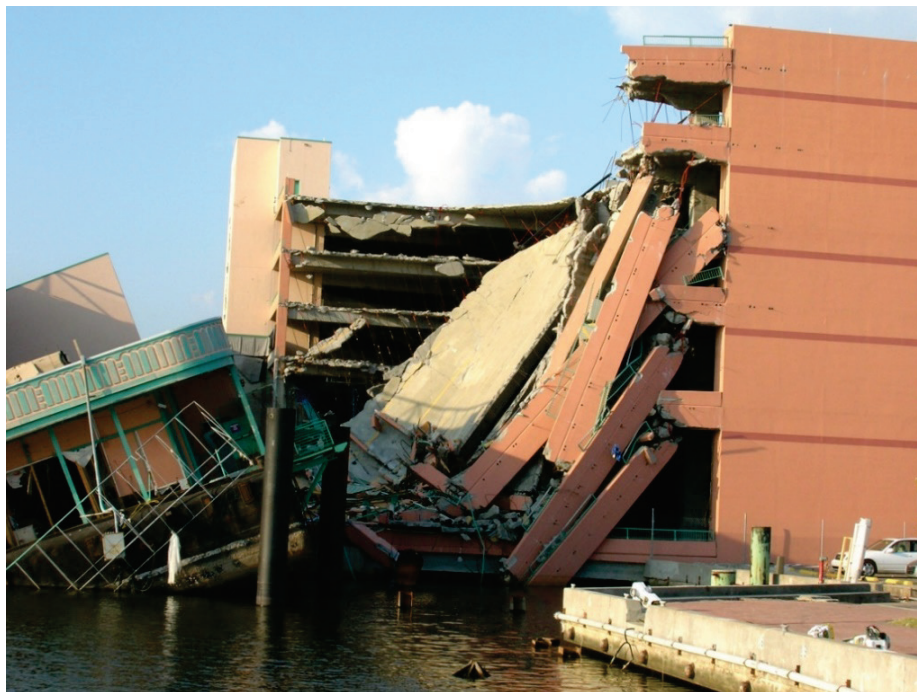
Progressive collapse of upper floors of a parking garage due to damage in lower level columns from impact of an adjacent barge-mounted casino, 2005 Hurricane Katrina (photo courtesy of I. Robertson).
